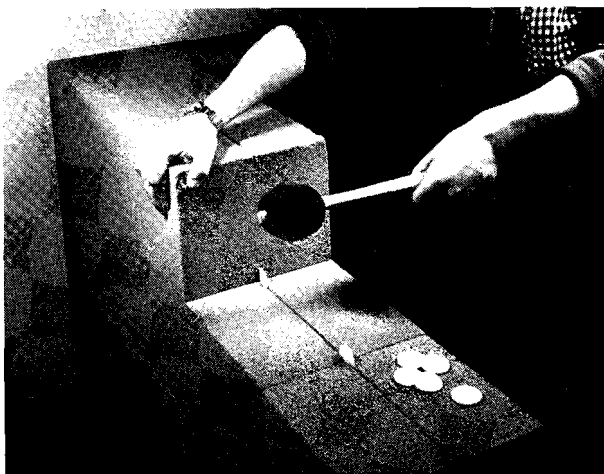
Precast lightweight concrete stave unit of high dimensional accuracy, with milled slots and nylon discs for all-dry assembly.
